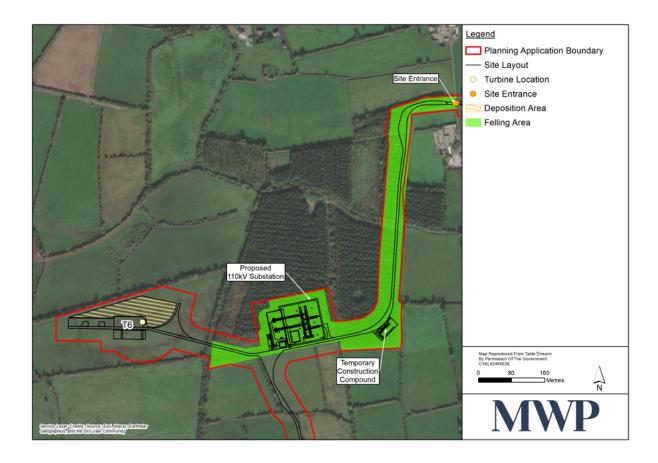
Areas where Conifer Plantation Felling will be Needed for the Proposed Substation and Temporary Construction Compound and Associated Access Tracks
